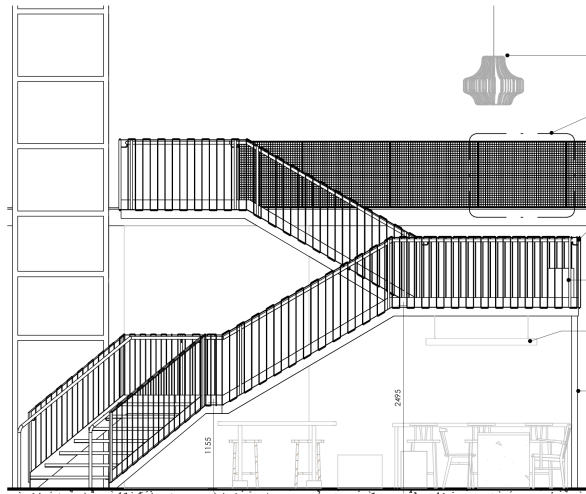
Staircase on plan, not to scale (Author, 2020)
